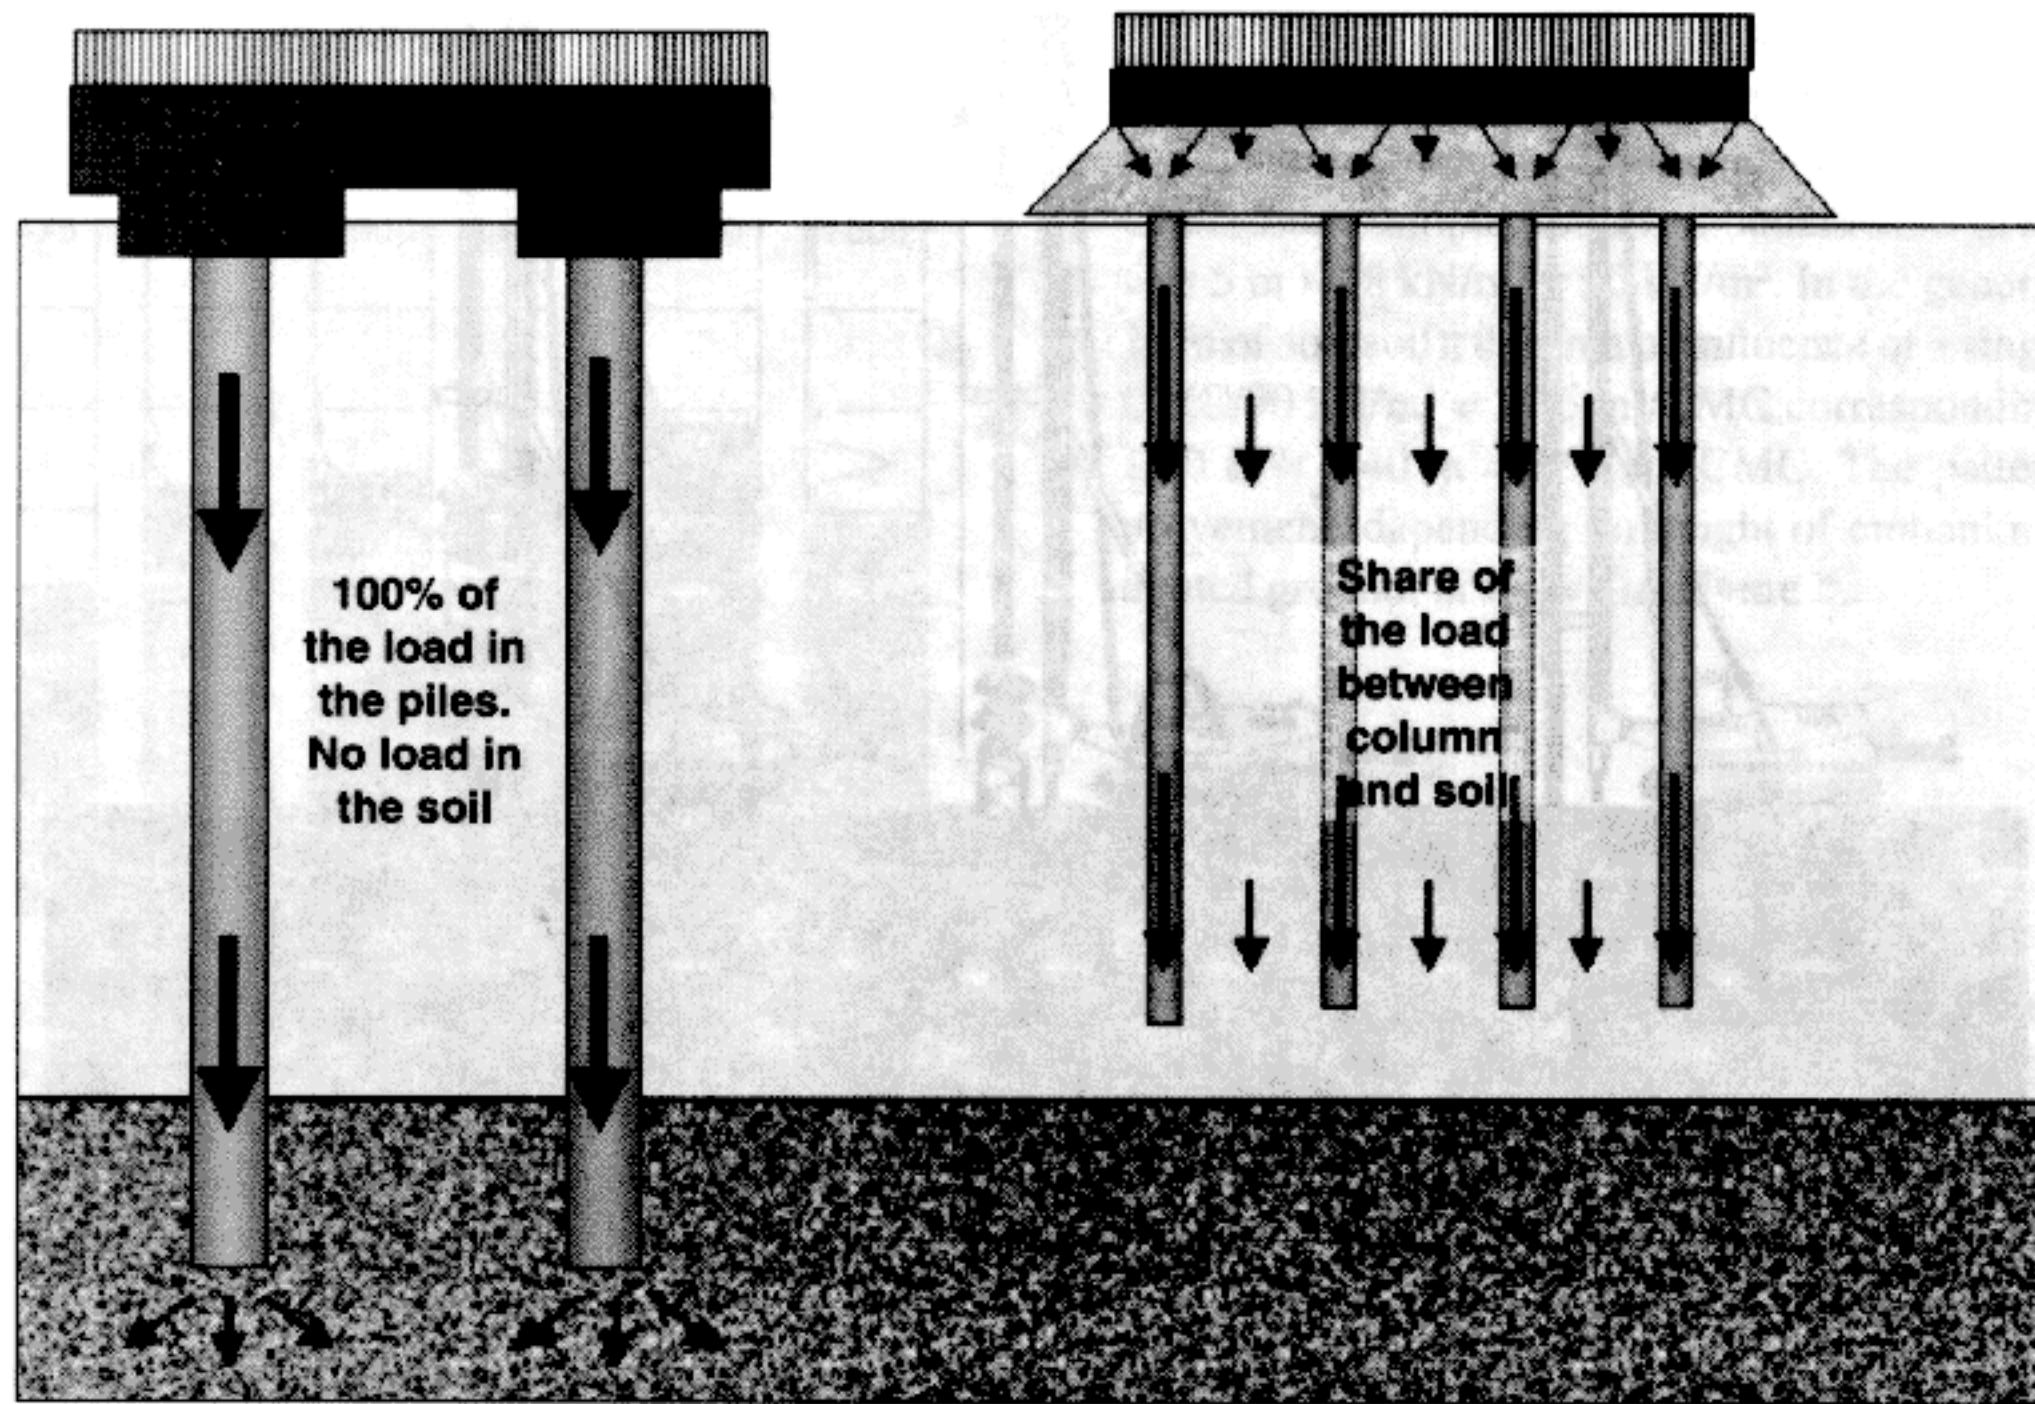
Load transfer mechanisms in conventional piling system (left) and columnar foundation system (right).
